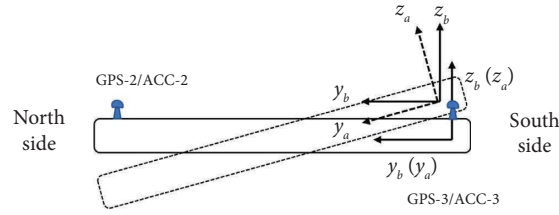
Bridge deck cross section at GPS-2 and GPS-3.
